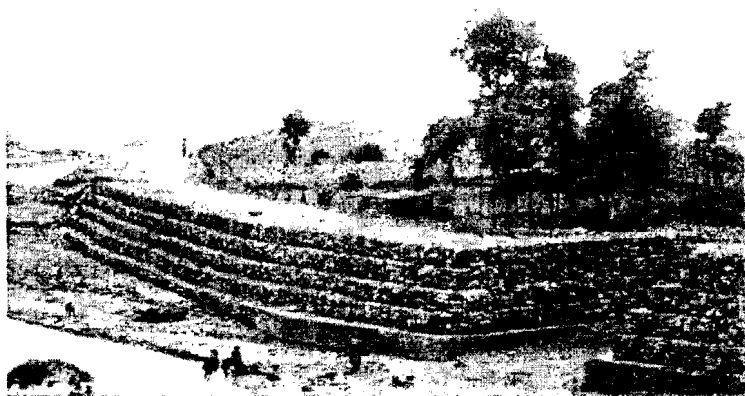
Newly renovated tight embankment d/s of Manahari Bridge. (Refer^{K6})
